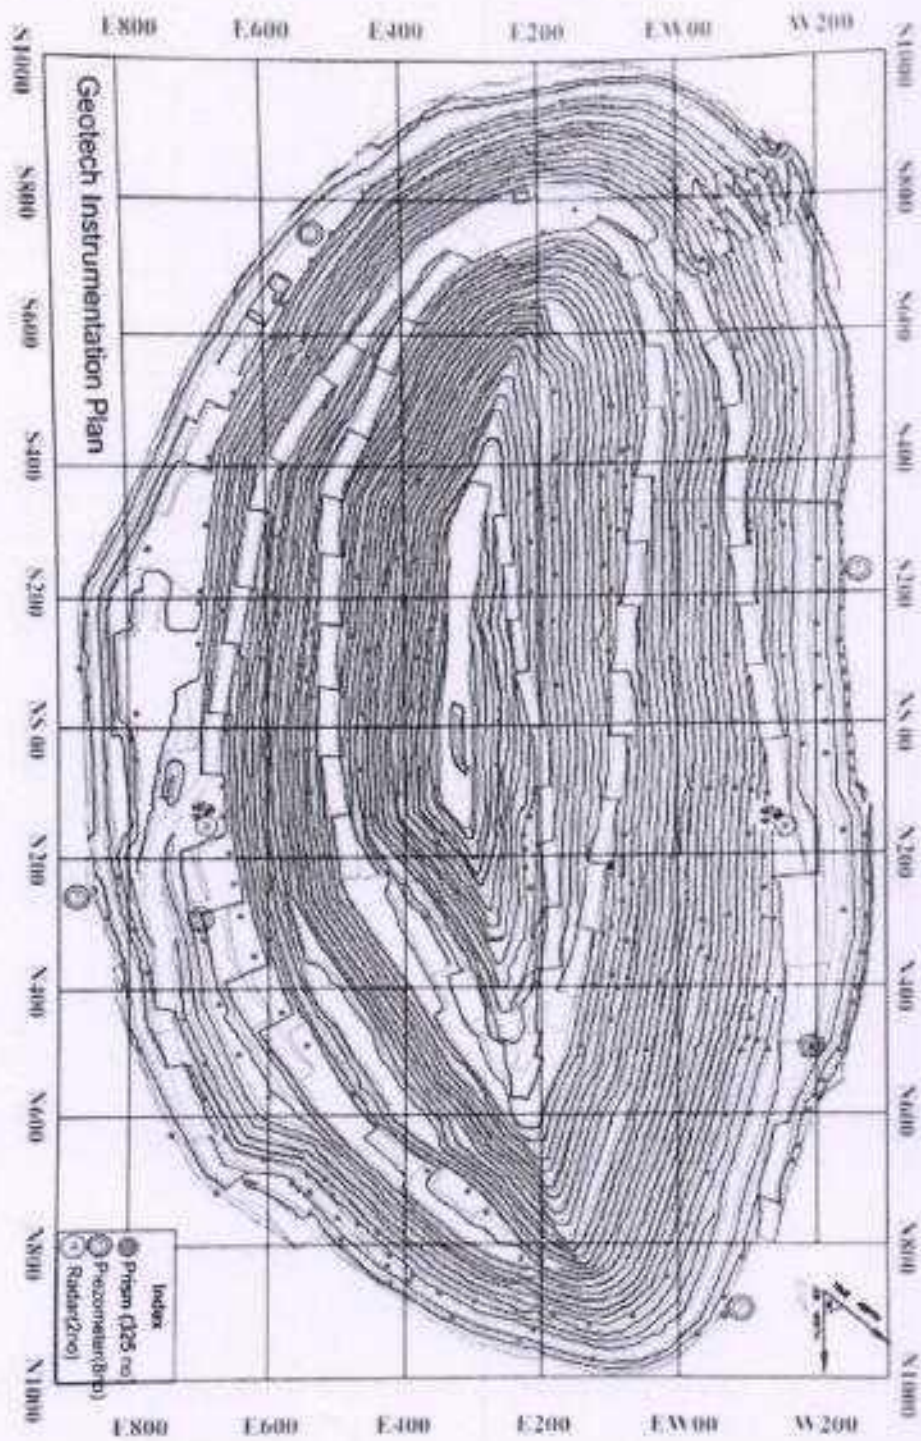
Geotechnical instrumentation plan with slope monitoring pillars.
